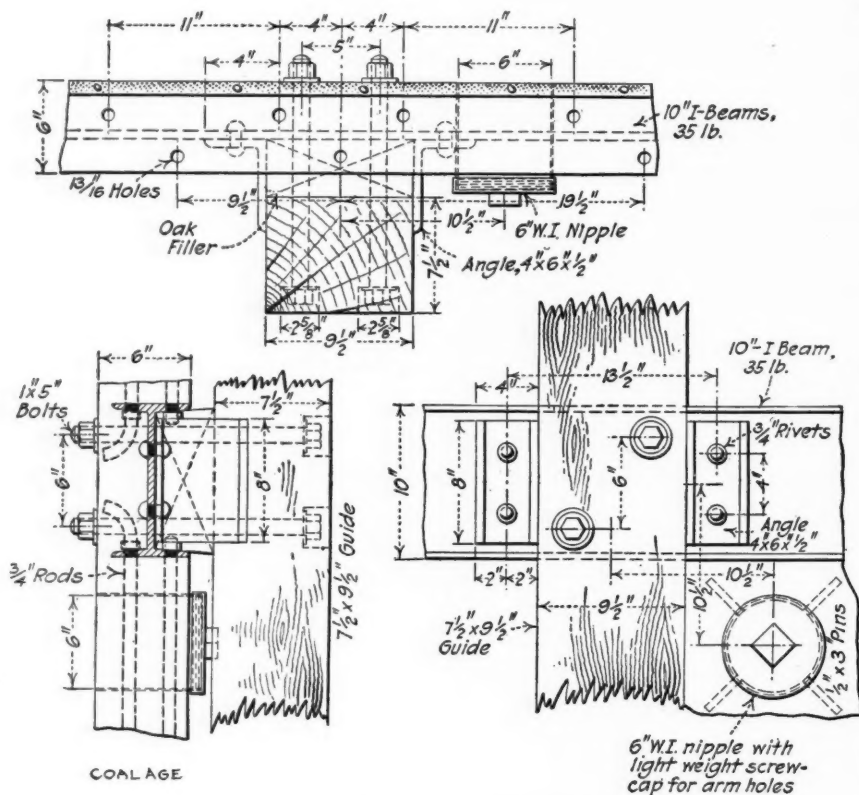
DETAIL OF GUIDE CONNECTIONS TO BUNTIONS
